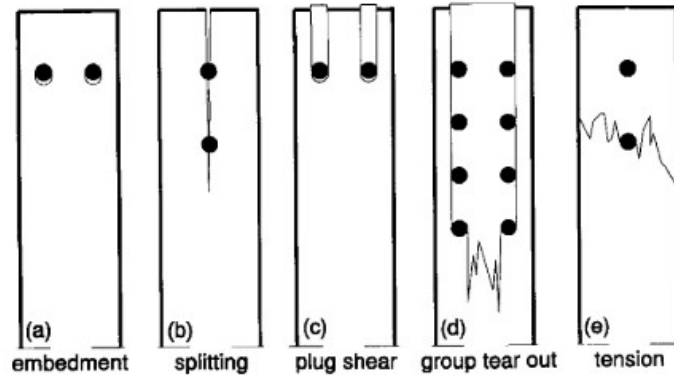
Failure modes for a connection with multiple dowel-type fasteners (Jorissen, 1998).
